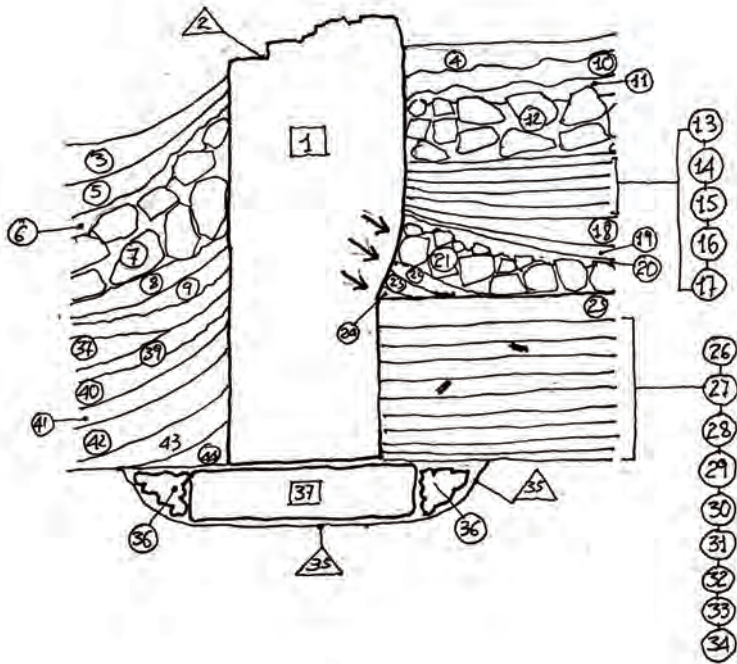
Internal/external stratigraphy, floors and masonry failures.
